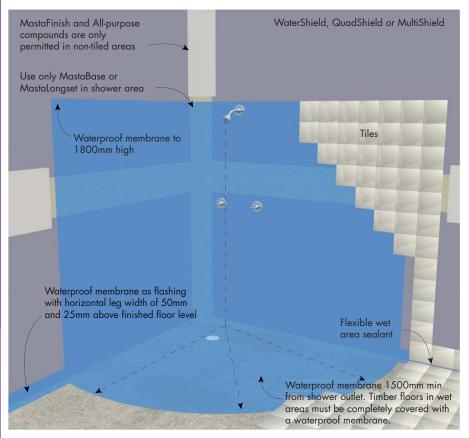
Internal In Situ Tray for Unenclosed Shower on Concrete or Compressed Fibre Cement Floor
